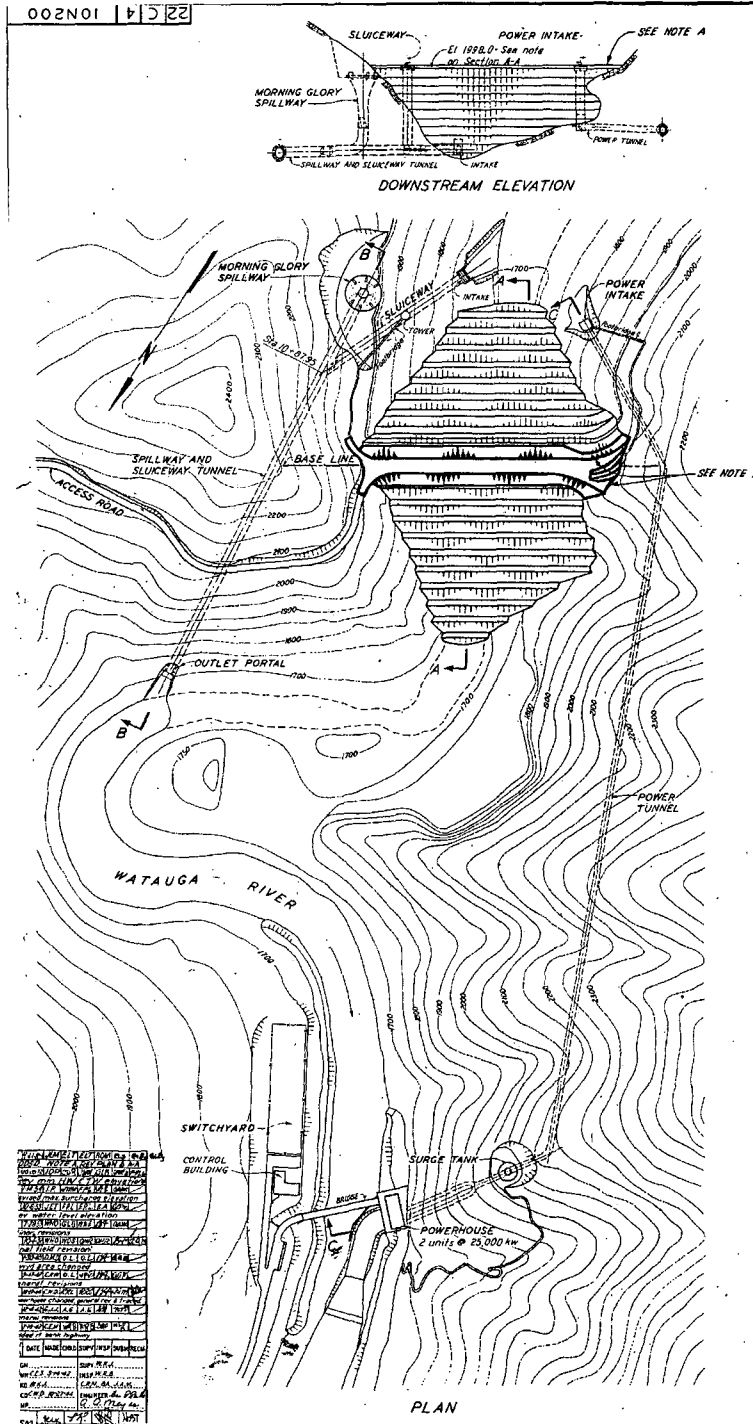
Watauga Dam, General Plan and Elevation (Ref. 1.1).
